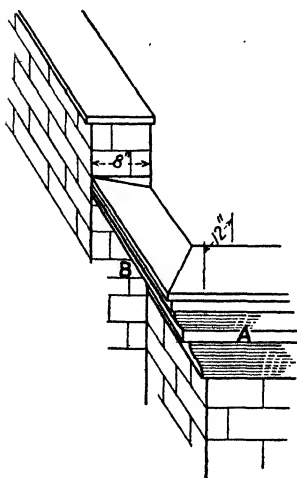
Perspective view showing a wide cornice intersecting a narrow cornice to form a mitered joint.
